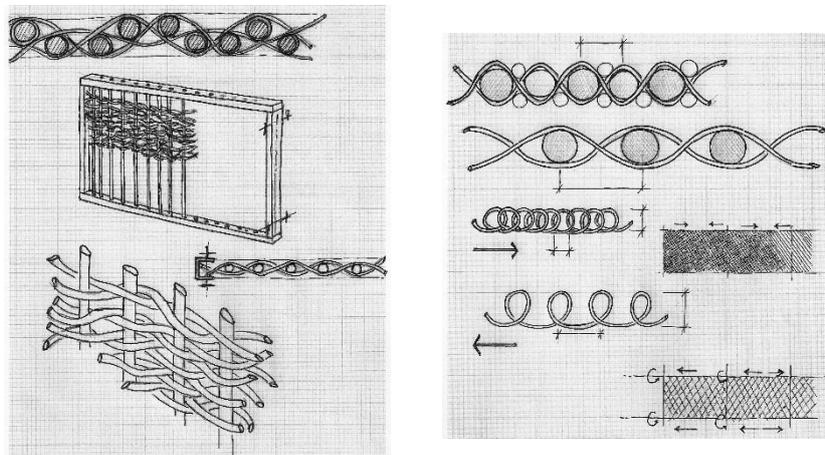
Sketches for new wall system are guided by generated construction as mutation of know-how technique [1].
